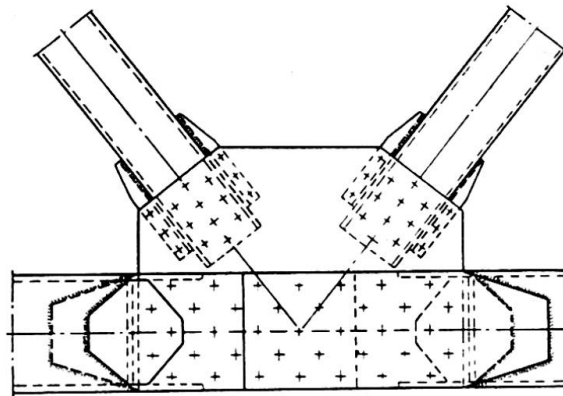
Detail of trussed girder. Welded box-girders; riveted field connections
